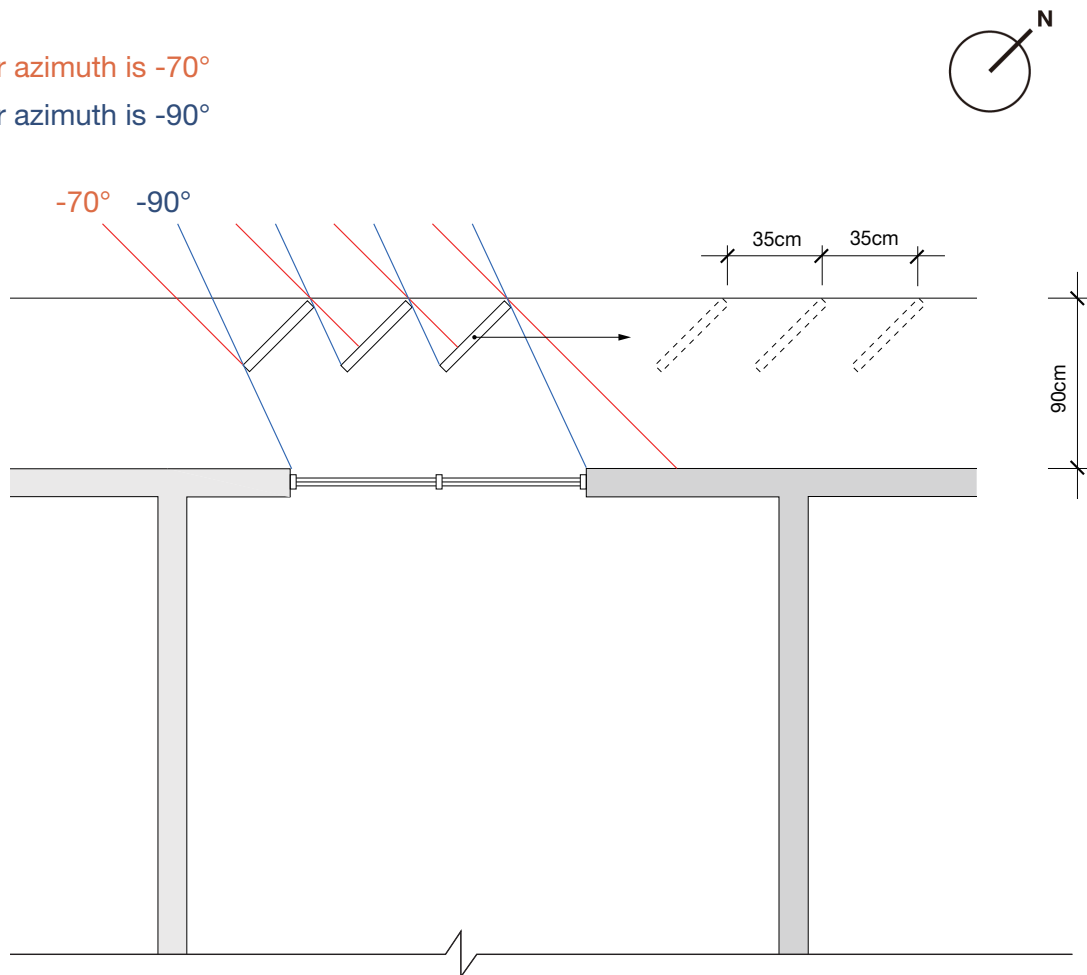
The plan of shading devices design in Northwest hotel room facade
